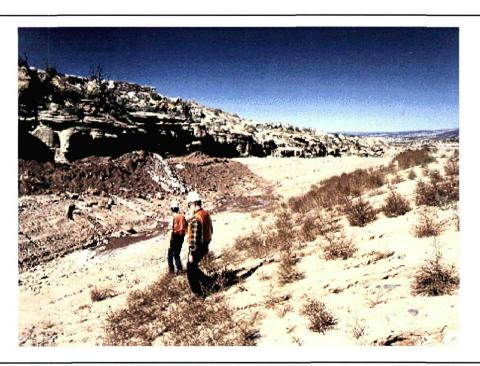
Diversion Ditch on Top of Tailings Pile #1-2, October 1999
